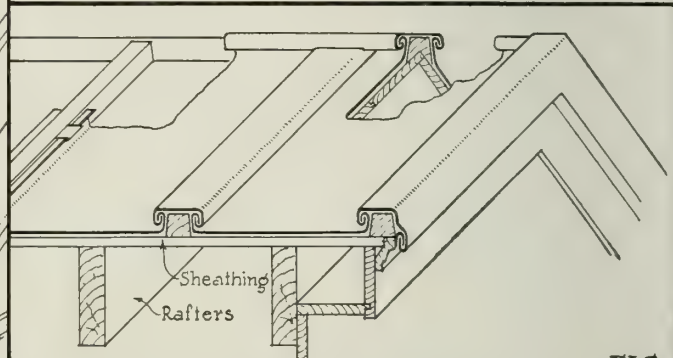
DETAIL SHOWING APPLICATION OF RIBBED SEAM COPPER ROOFING
